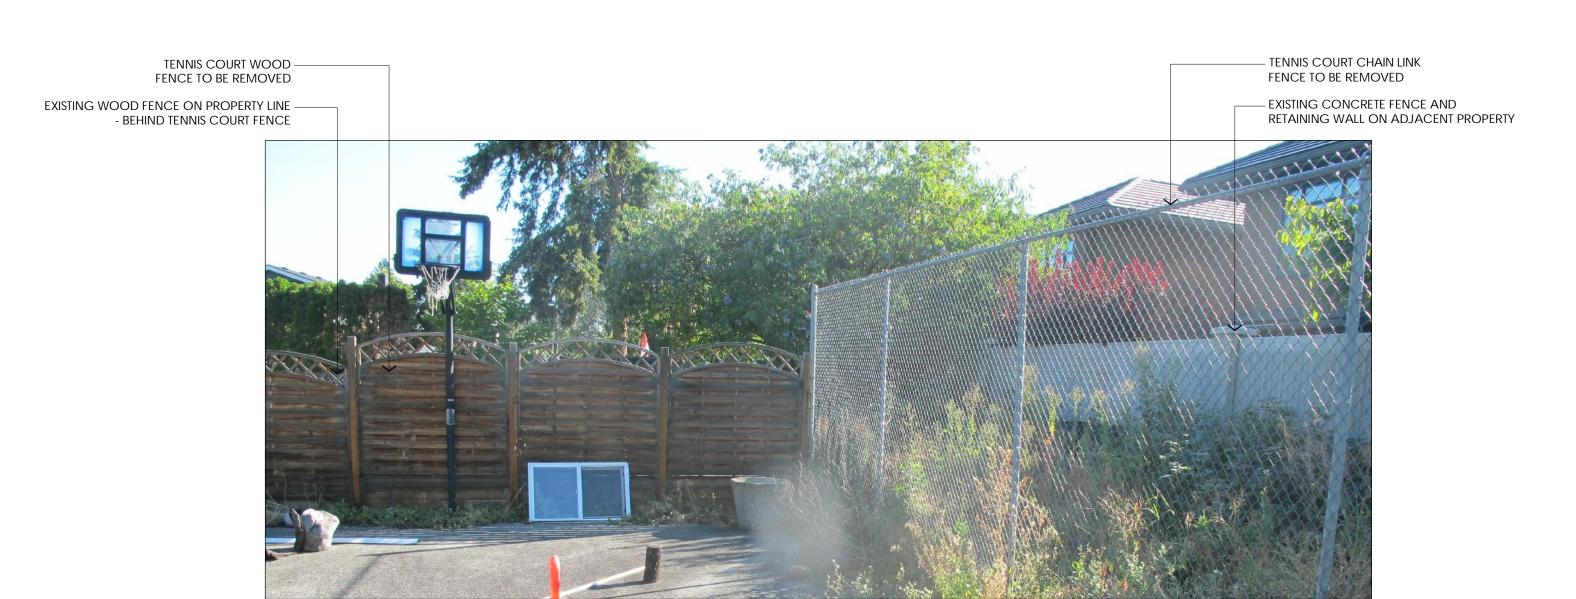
PHOTO - EXISTING CONDITIONS - SOUTH ELEVATION
